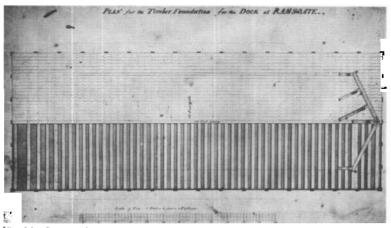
Smeaton's Plan for Timber Foundations in Dry Dock 1788.
